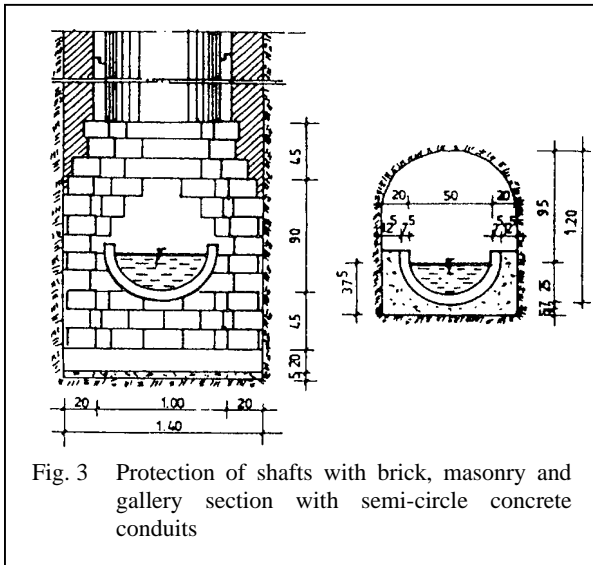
Protection of shafts with brick, masonry and gallery section with semi-circle concrete conduits
